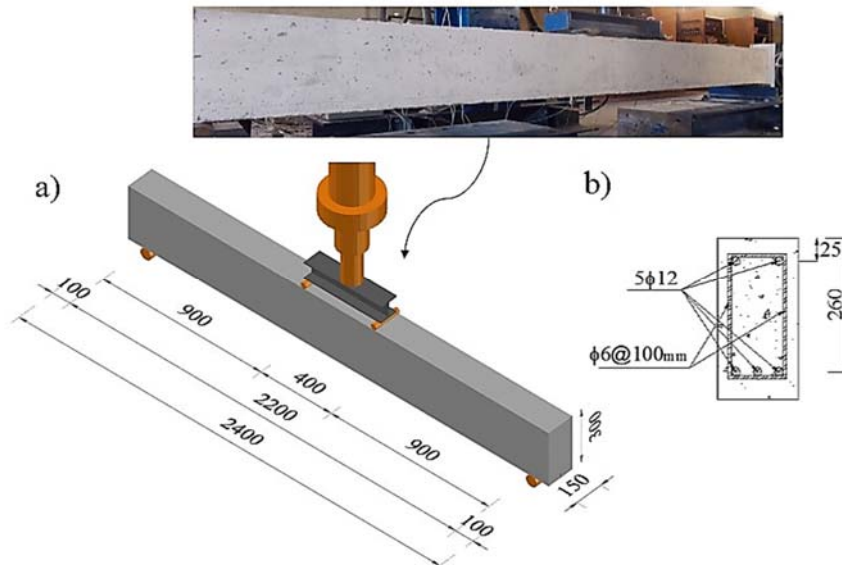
The beams of the experimental program: a) geometry and loading configuration; b) steel reinforcement (dimensions in mm)
